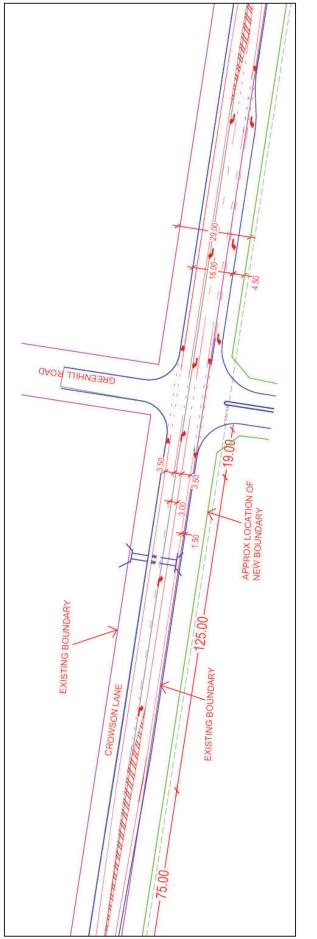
PROPOSED INTERSECTION WITH CROWSON LANE (INTERIM LAYOUT)
